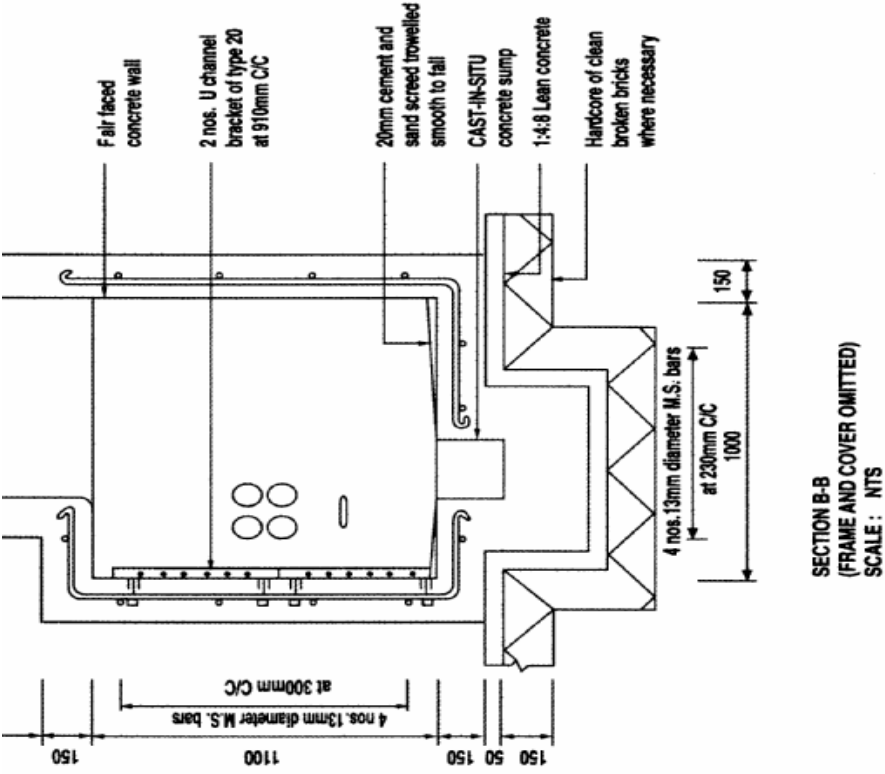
Manhole Drawings – Type MX1 & MX2
